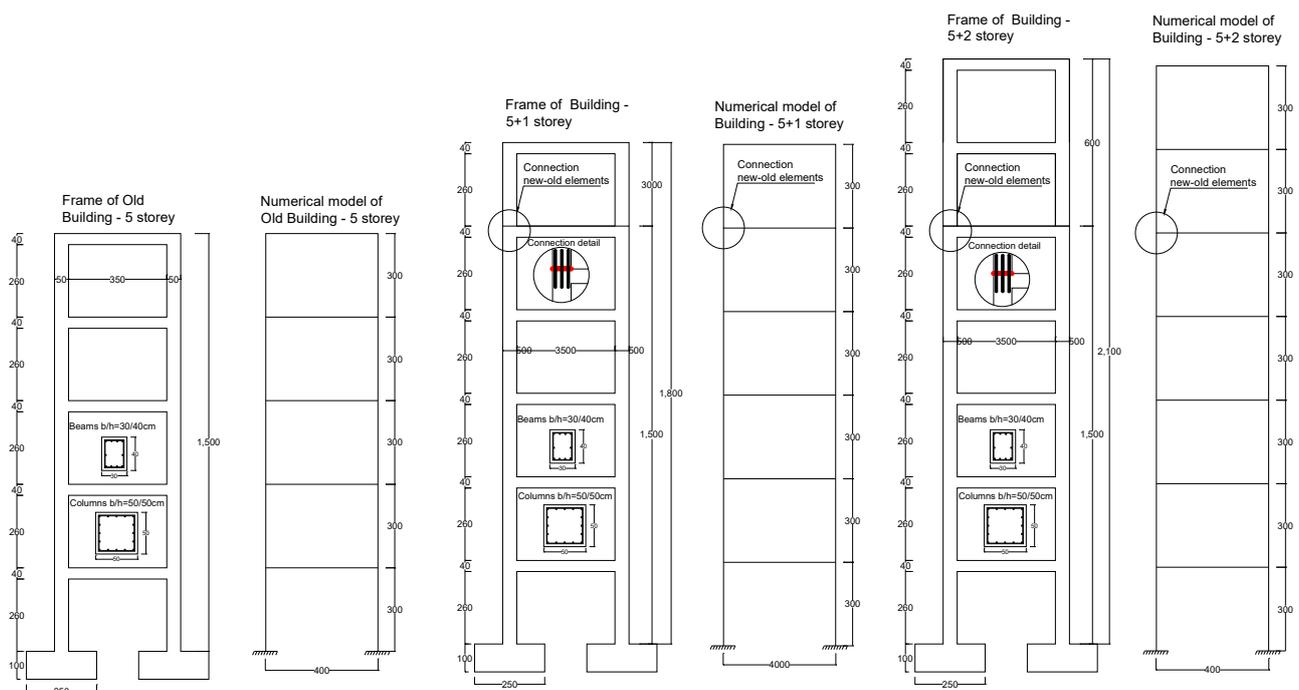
Numerical model and column and beam cross-sections of the old frame and the frames with additional floors.
